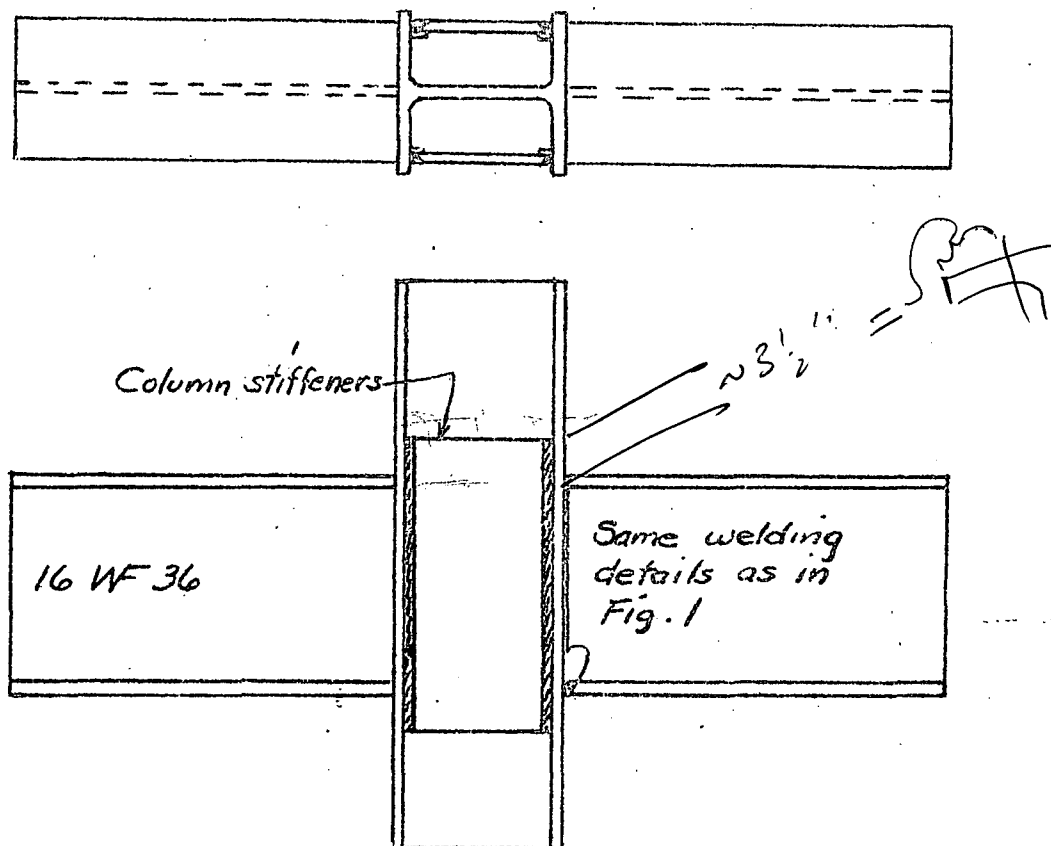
B. COLUMN STIFFENERS PARALLEL TO WEB OF COLUMN
